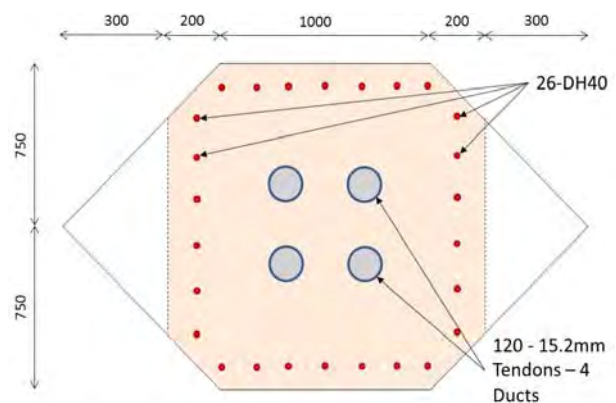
Bridge Rocking Section Design (Example from Kapiti Road Underbridge)
